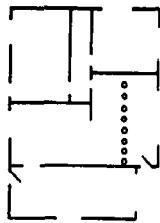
Precast Concrete House, Horizontal Traverse along Centerline of Living Room 3 Inches above Floor; 42.5-Inch Source Radius
